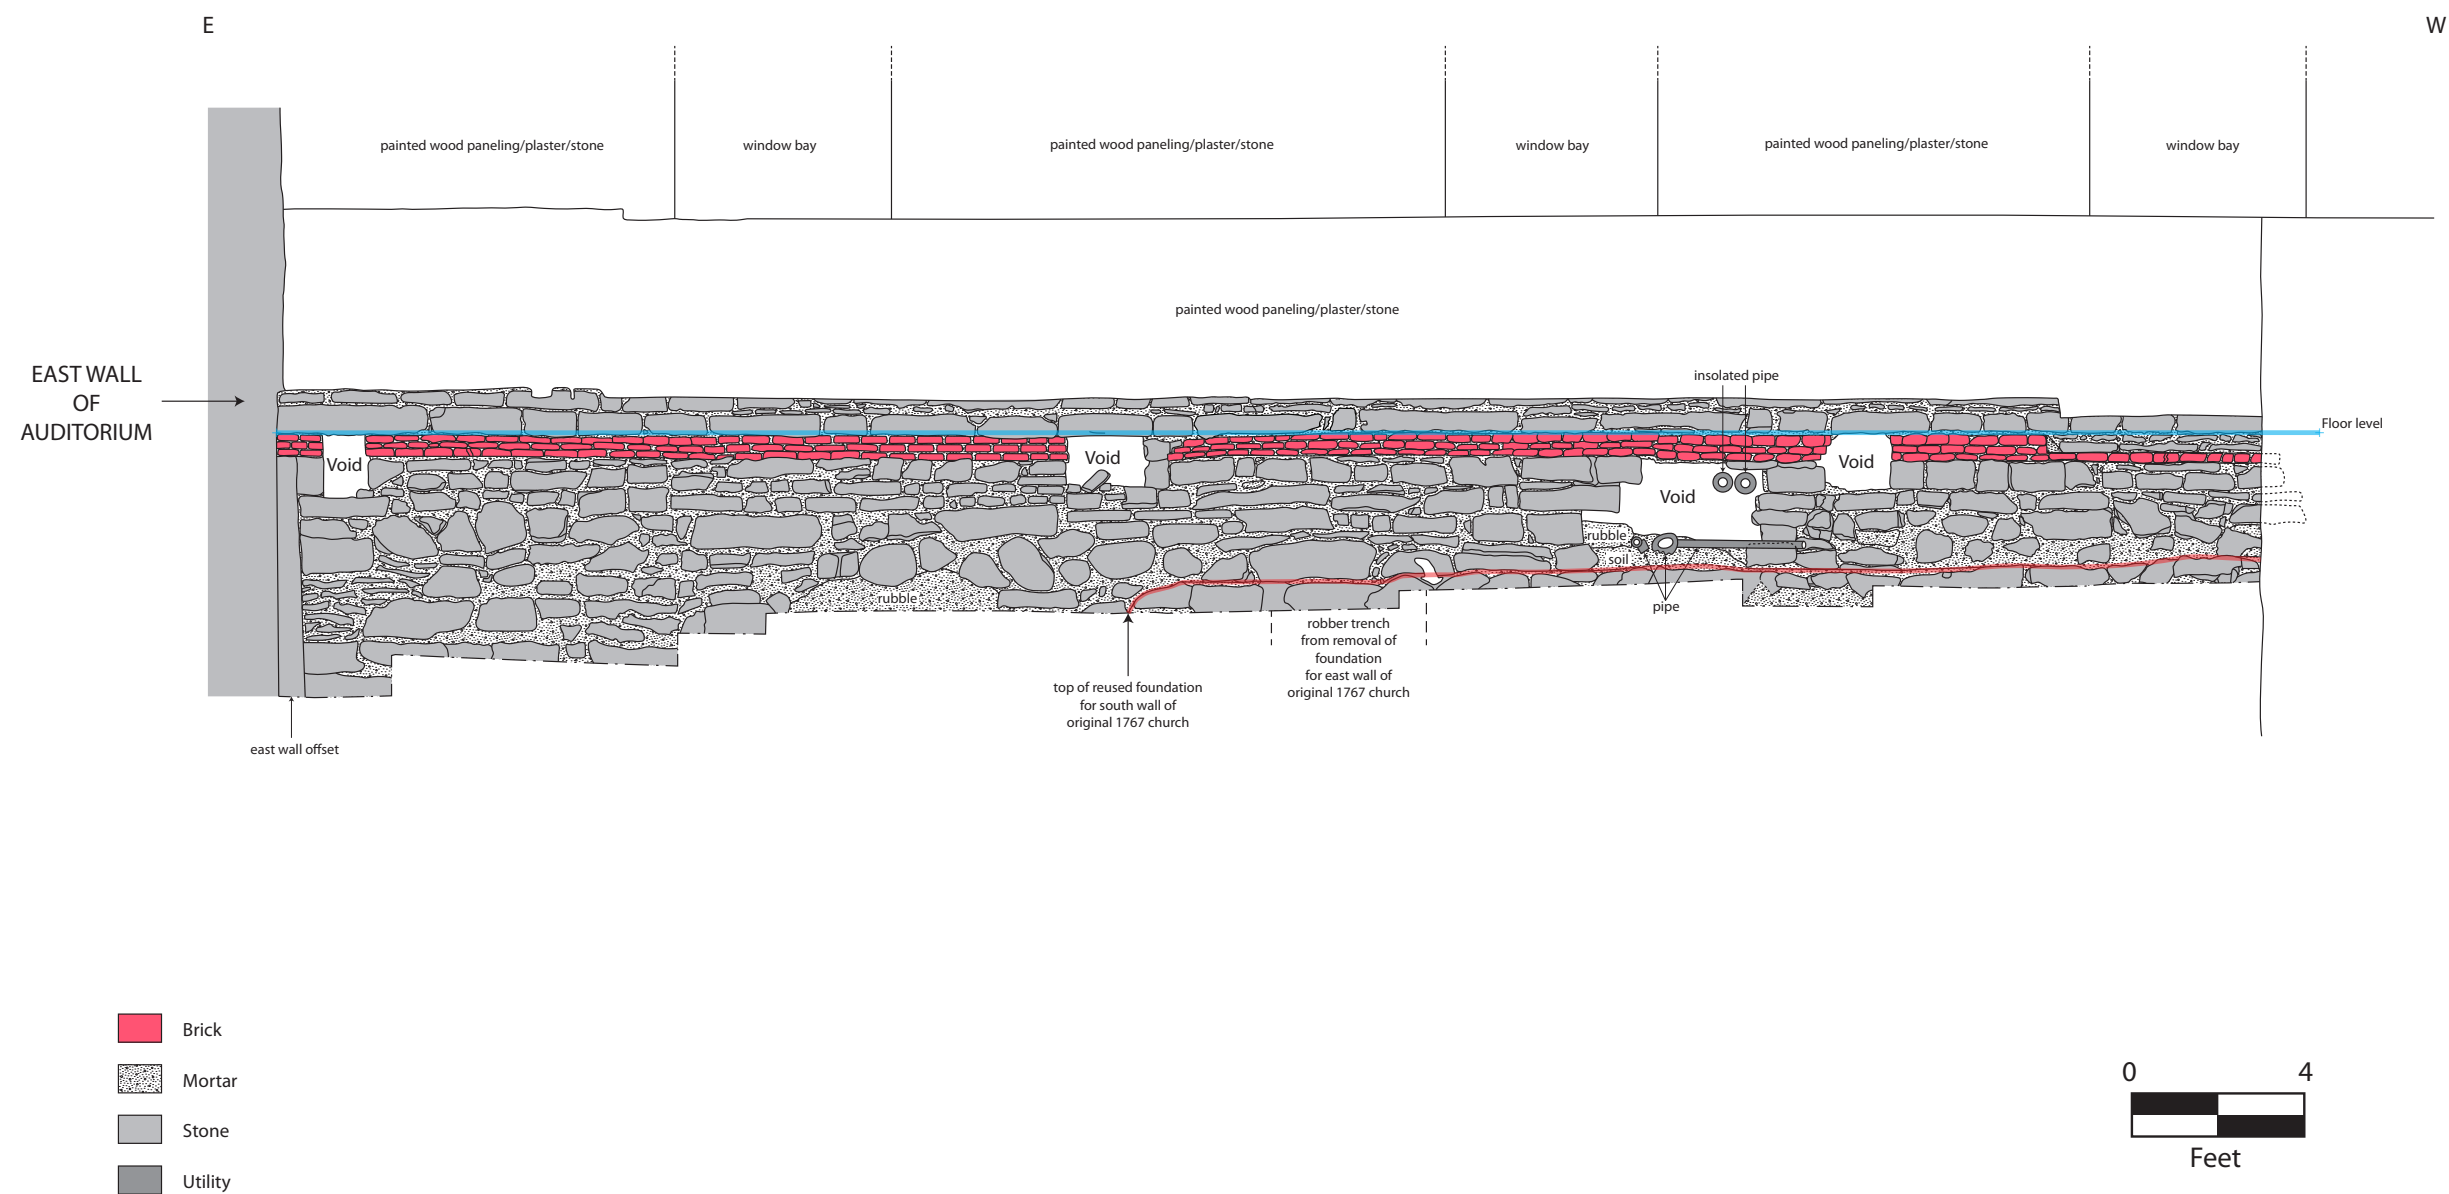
Church Interior, South Wall Elevation in Trench 2.
